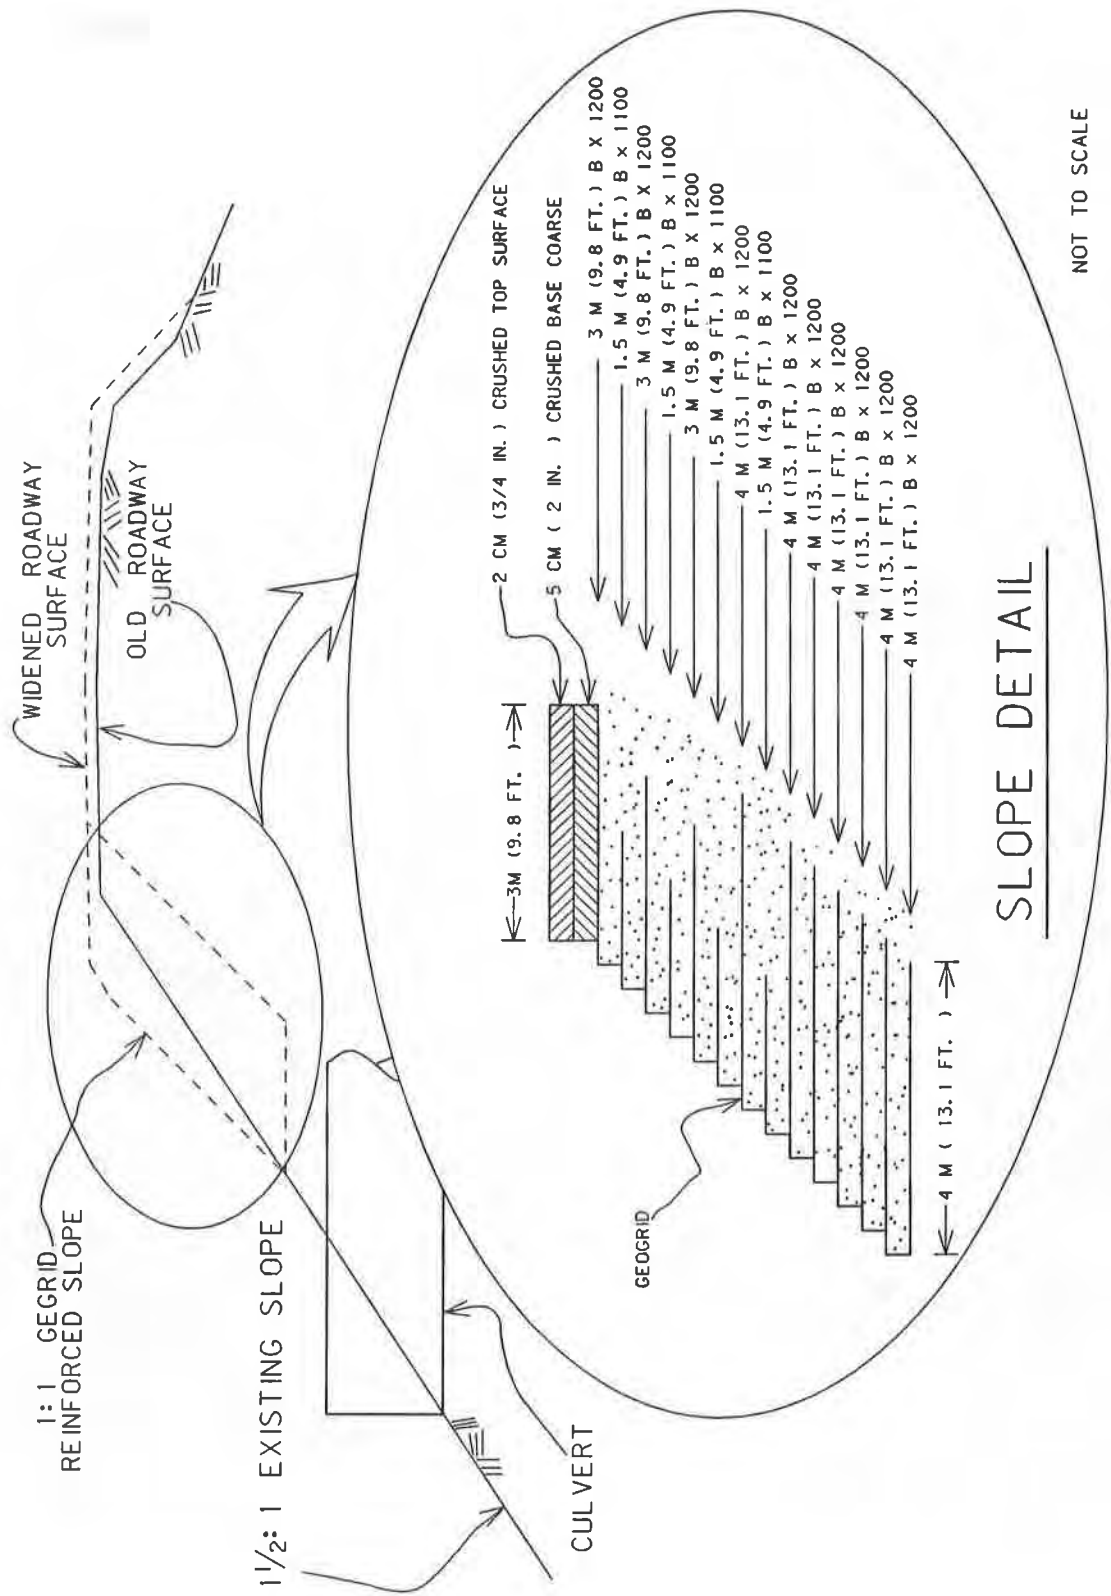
DESIGN SKETCH OF GEOGRID REINFORCED SLOPE USED TO WIDEN EXISTING ROADWAY OVER CULVERTS, (GILDFORD - EAST PROJECT).
